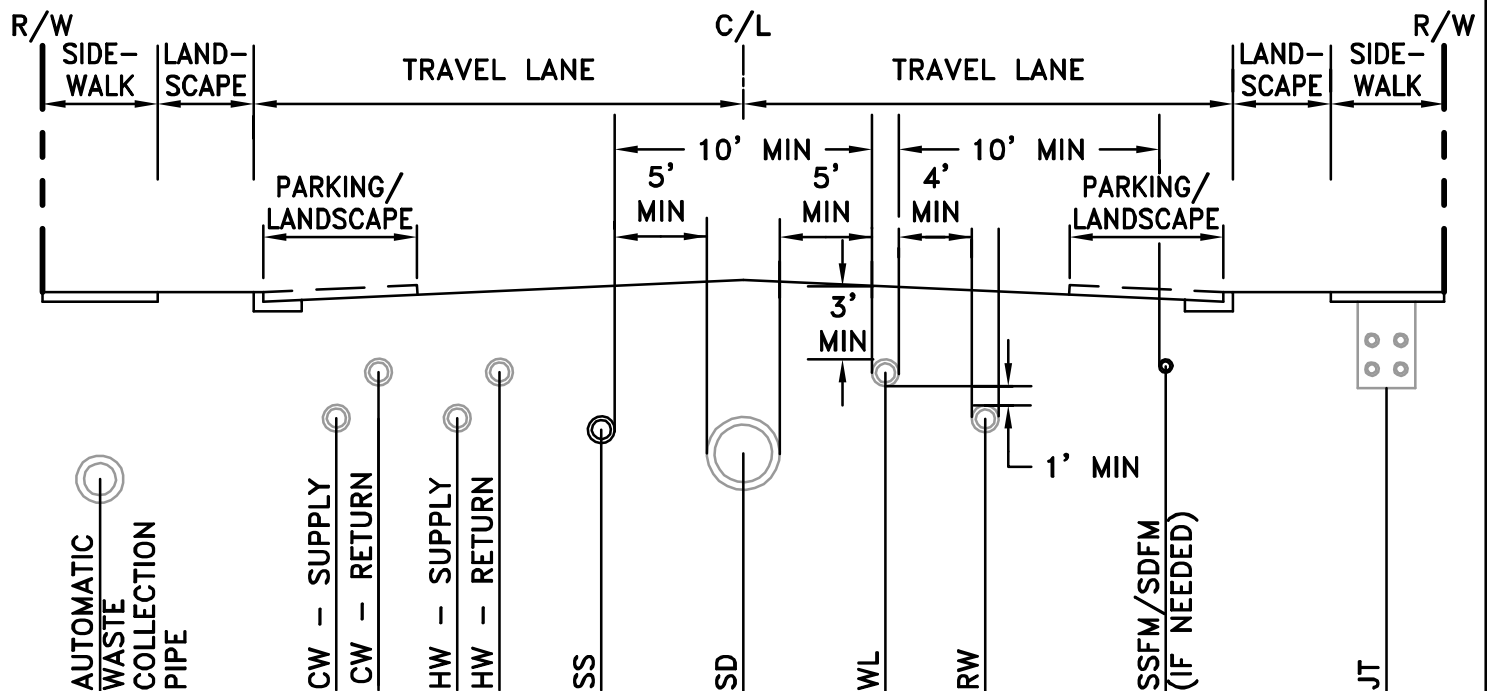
Detail of Wastewater Collection System in Streets
